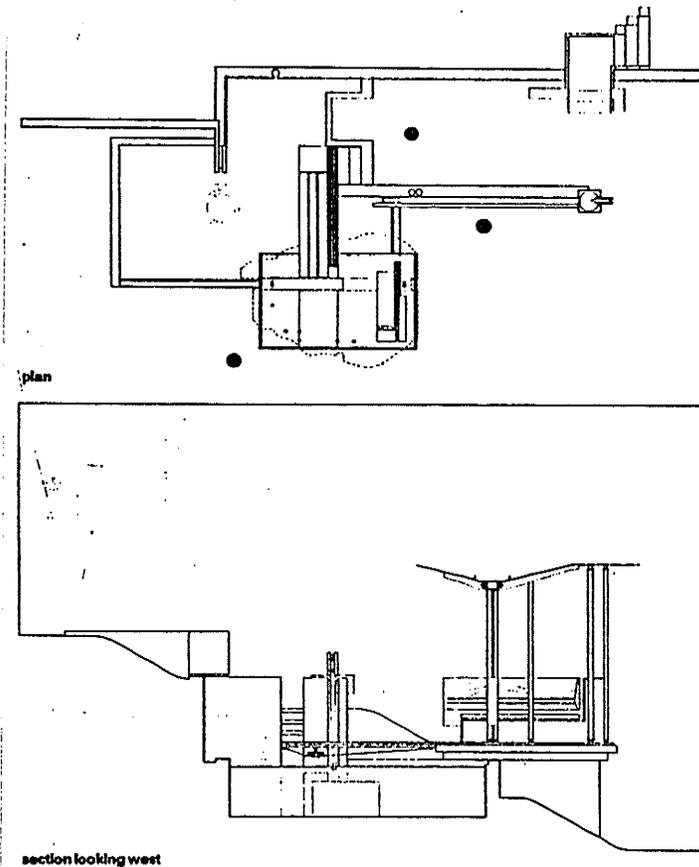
Plan and section of the Toronto garden shelter. (Buchanan, 1991)
